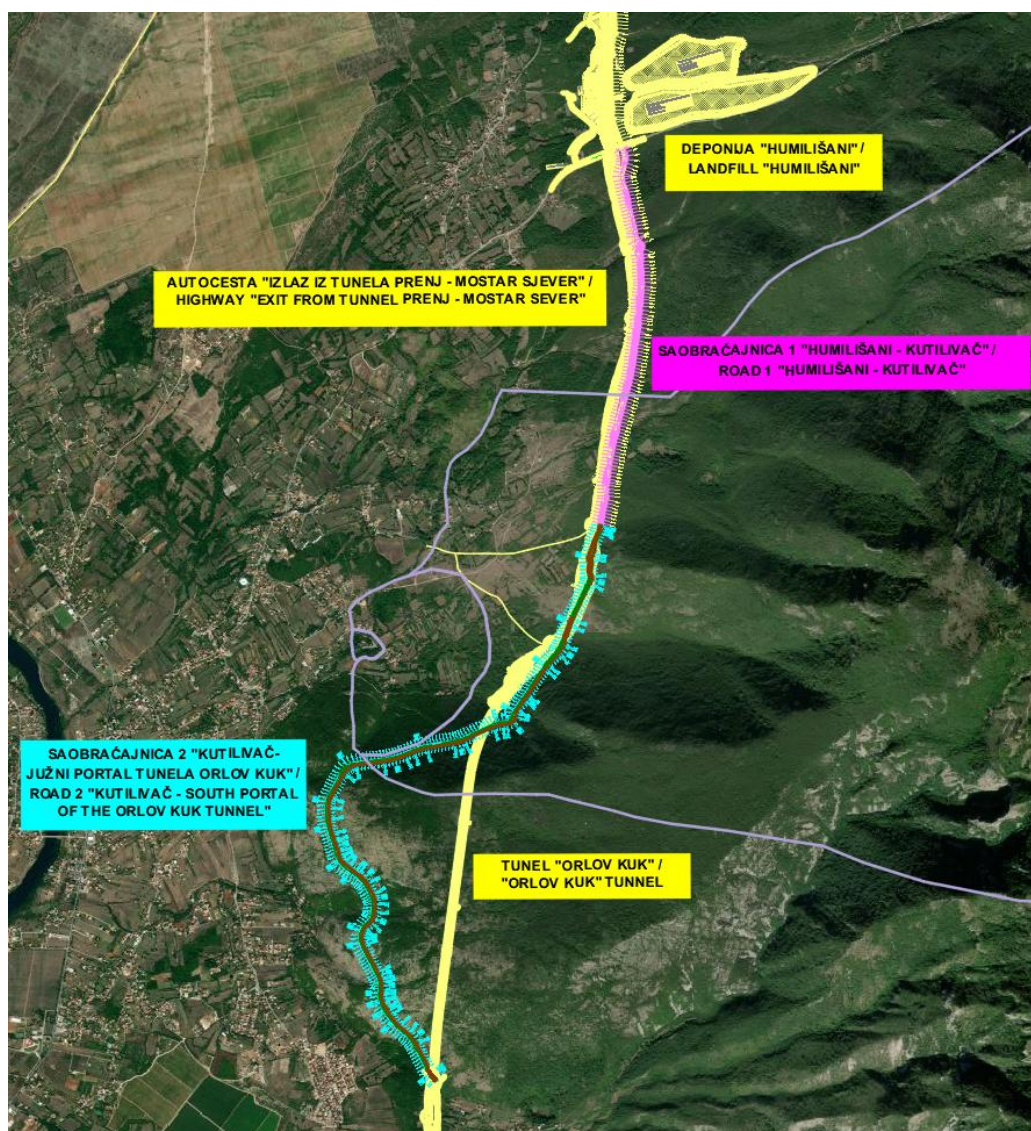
Southern access road to Humilisani disposal site (Section 1 marked in purple, Section 2 marked in blue)
